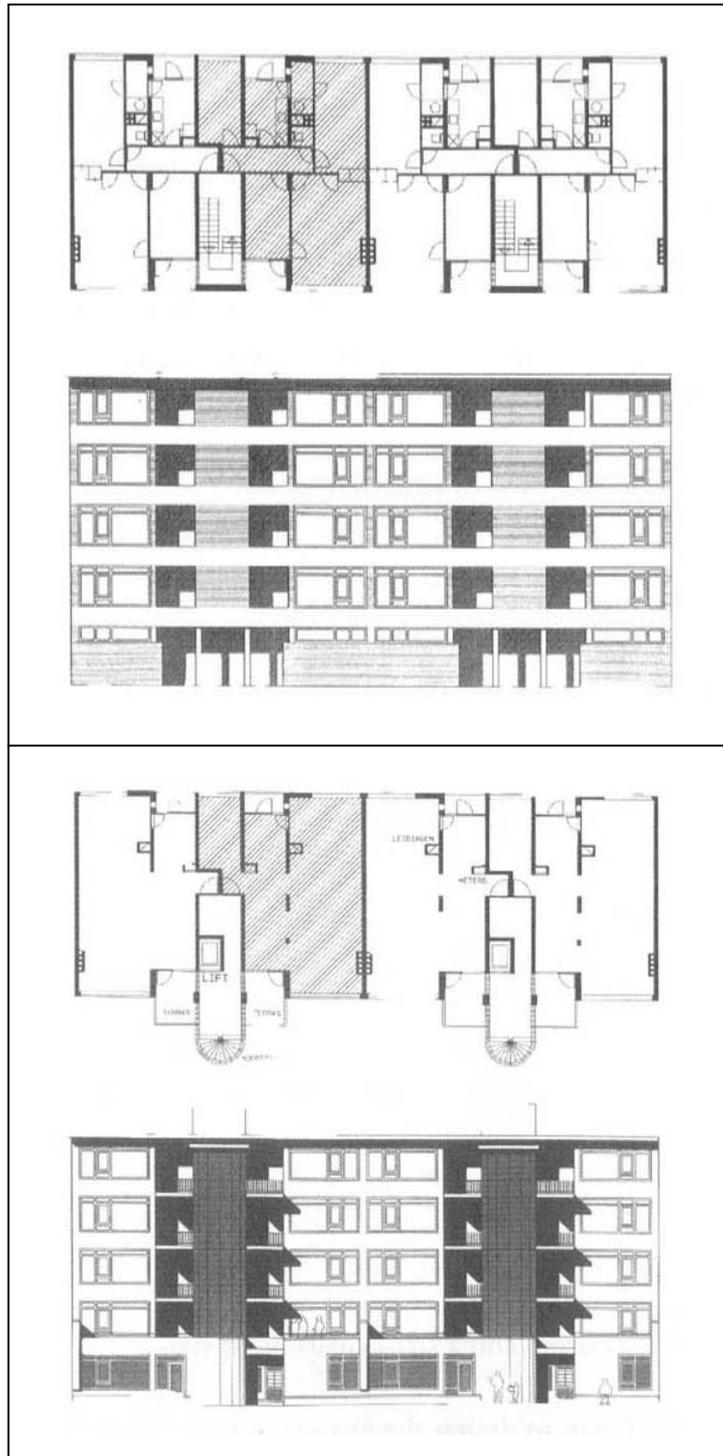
Typical building plans and elevations before and after Support renovation (Kendall & Teicher, 2000).
